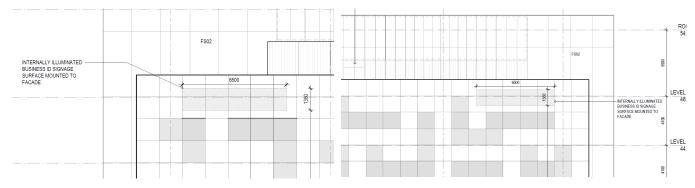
Sign 1 (northern elevation) and Sign 2 (southern elevation)Source: DCM
